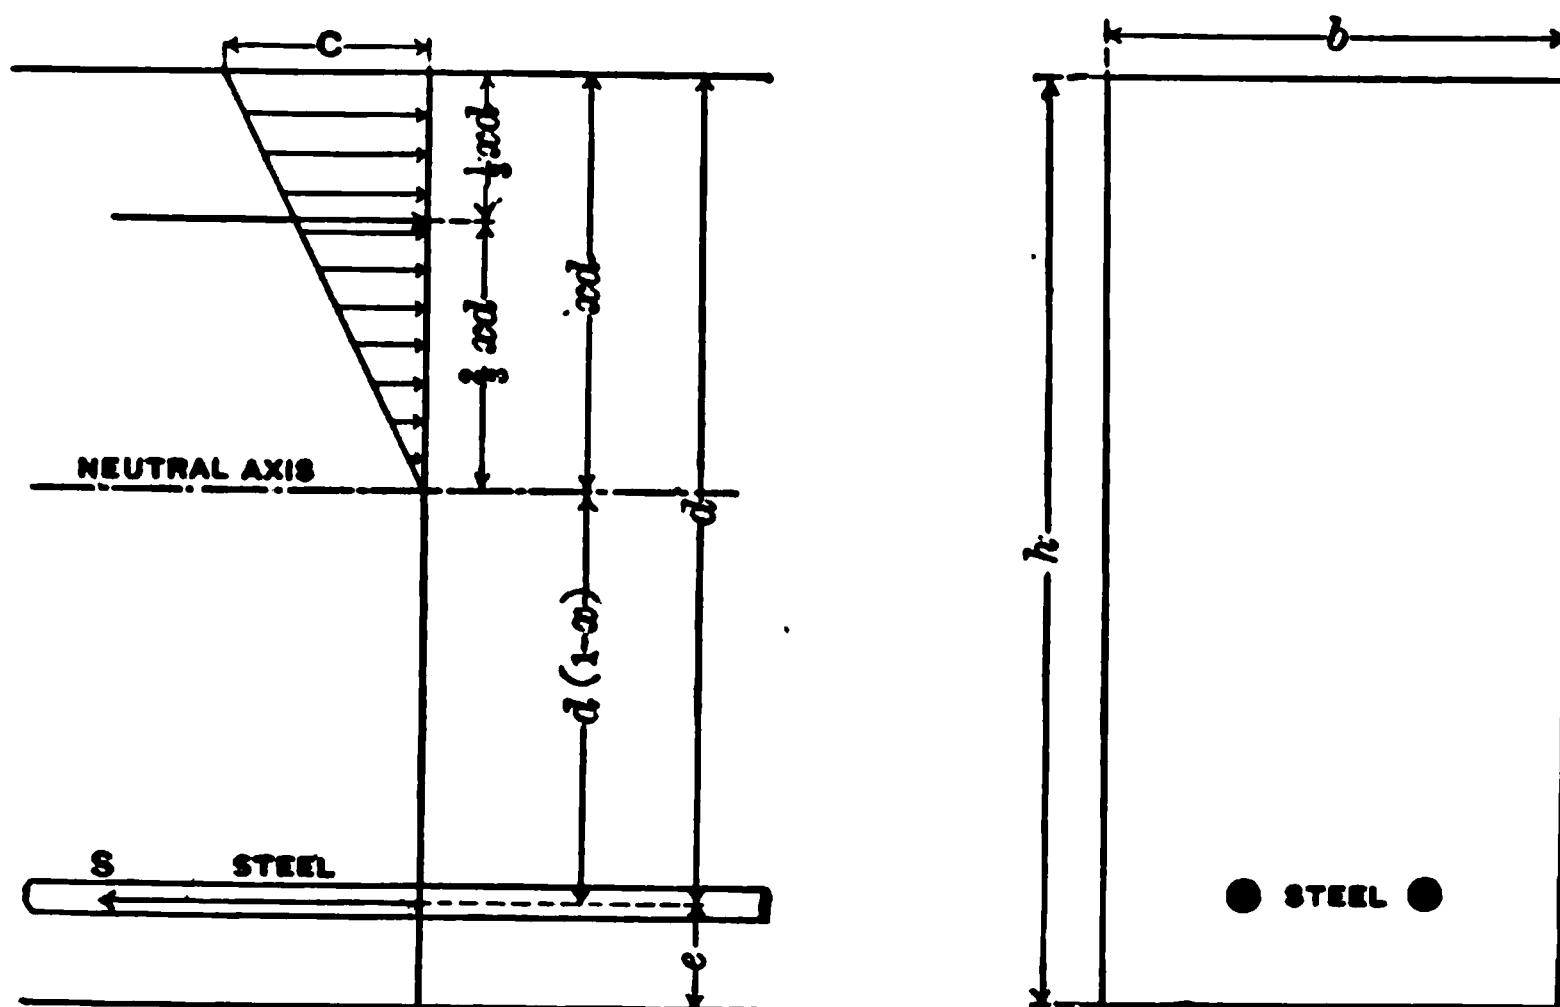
Resisting Forces in a Reinforced Concrete Beam. (See p. 296.)
